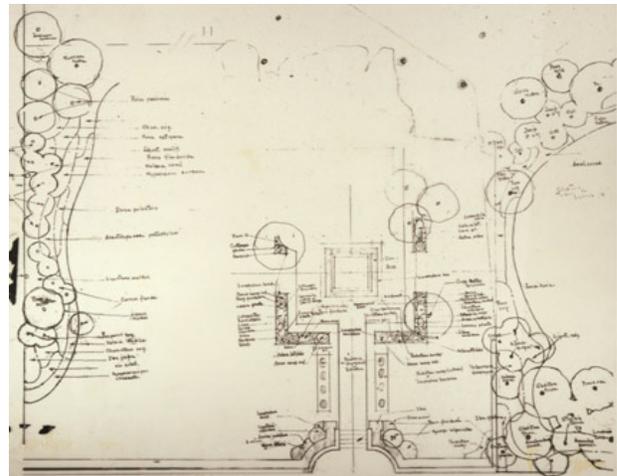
Alden Hopkins' 1937 planting plan for the Mary Washington Monument site.
